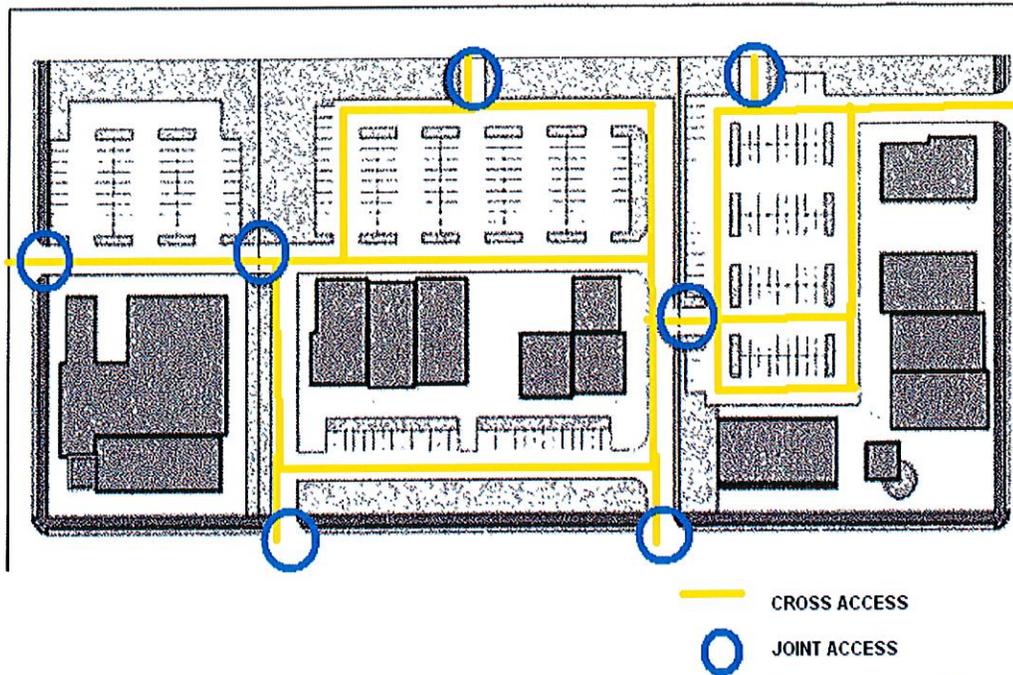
Cross access between parking areas and adjacent properties. Joint access through the use of common driveways entrances and between properties.
